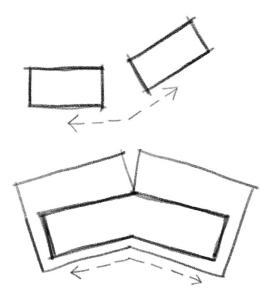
Diagrams highlighting roof forms of proposed buildings
